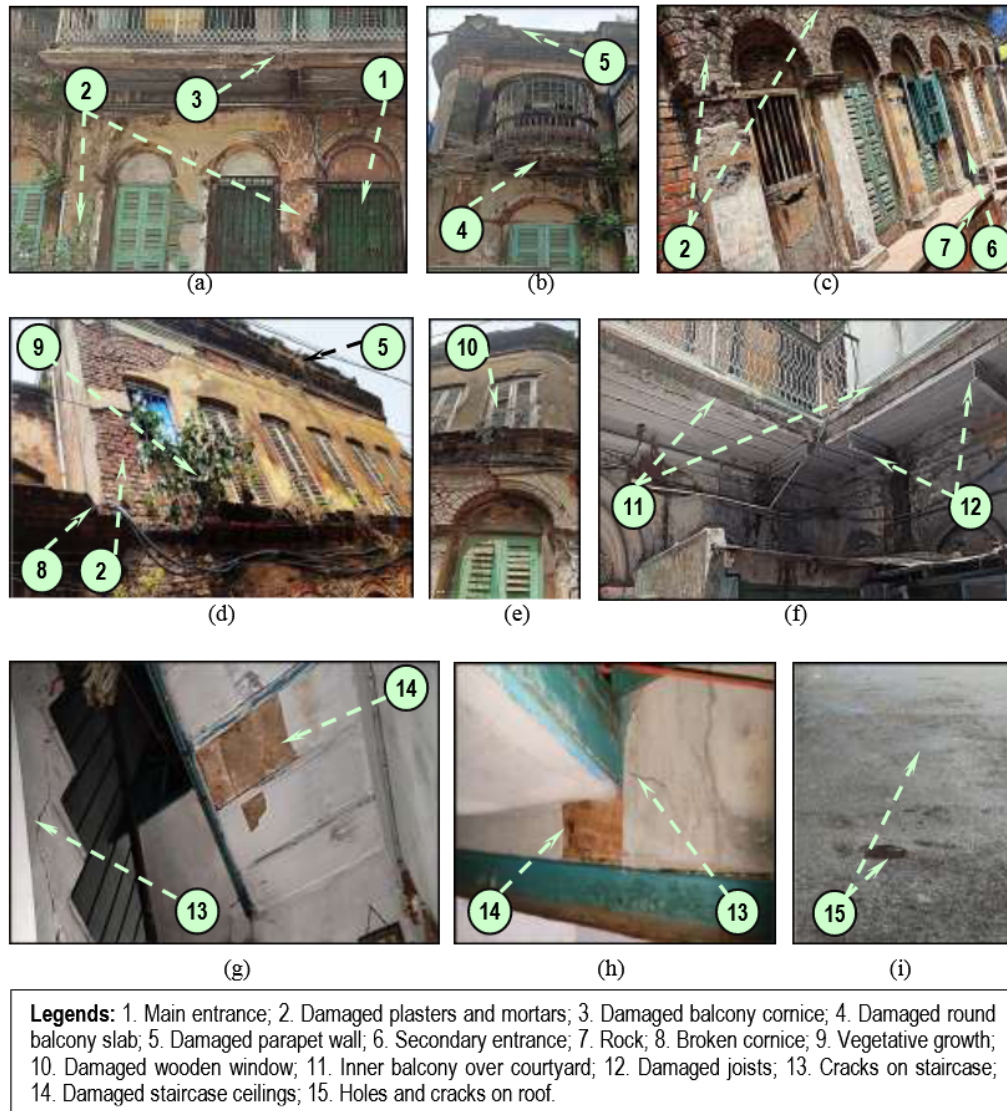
Pre-rehabilitation building condition: (a) Front view, (b) Details of front edge, (c) Side view – ground floor, (d) Side view – upper floors, (e) Southeast corner, (f) Inner balconies, (g & h) Staircase, and (i) Roof
